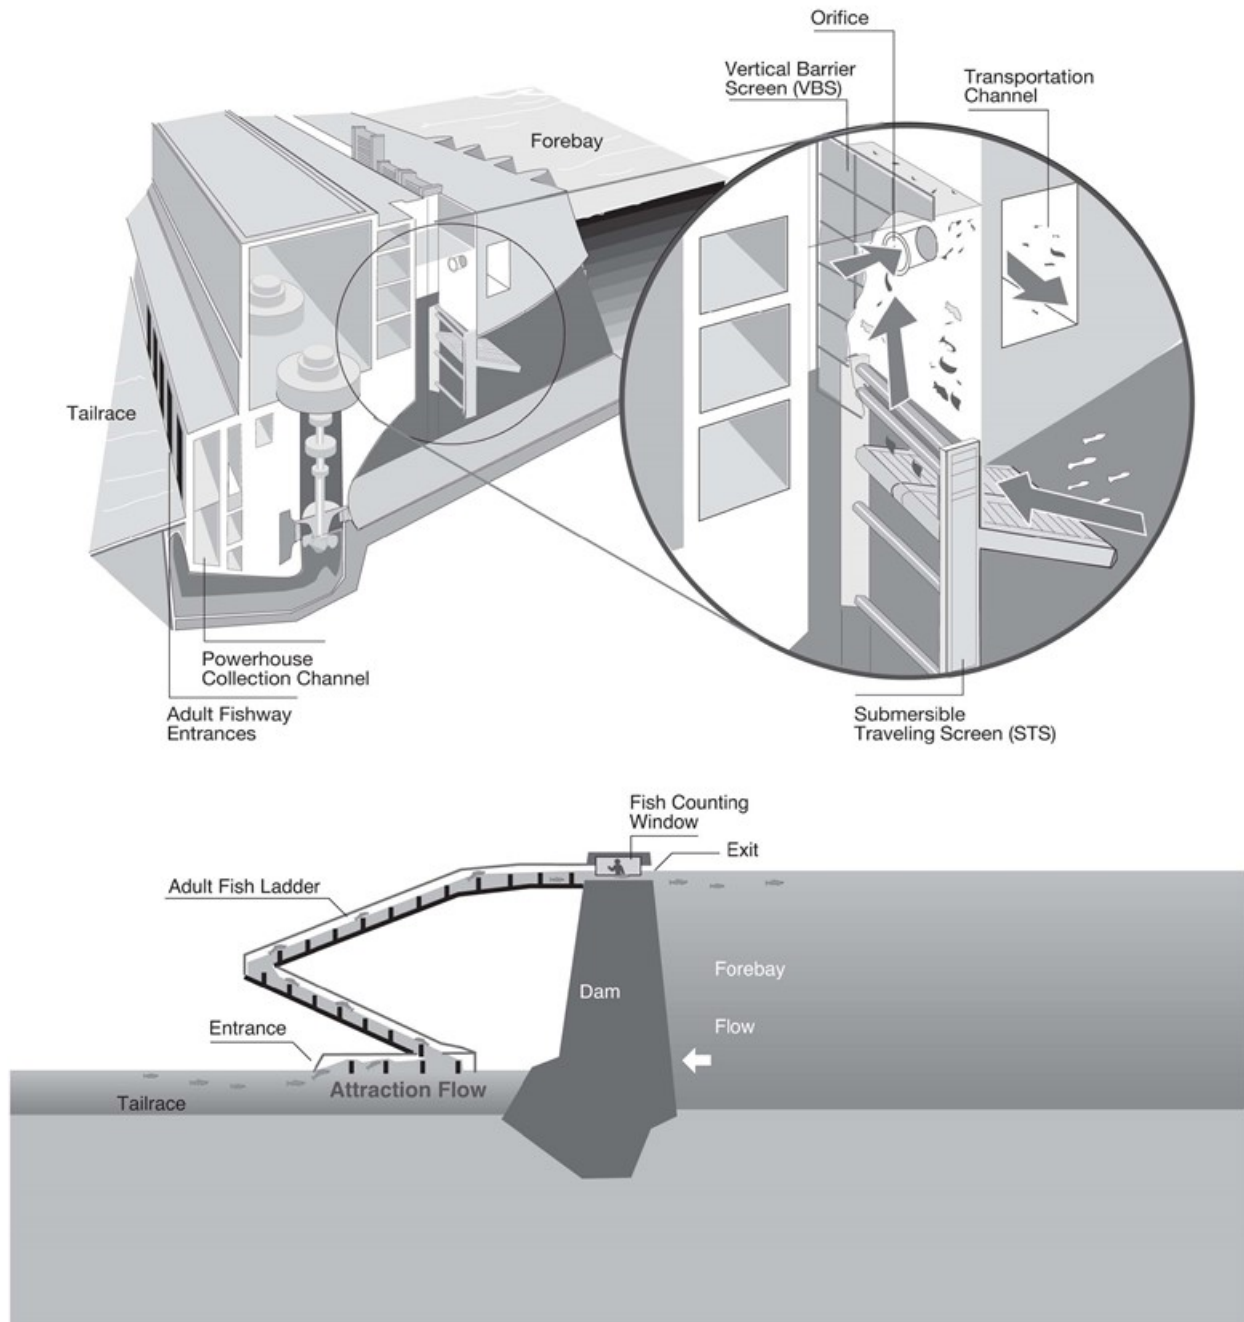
Example Design of Fish Passage Structures at CRS Corps Hydropower Projects.
